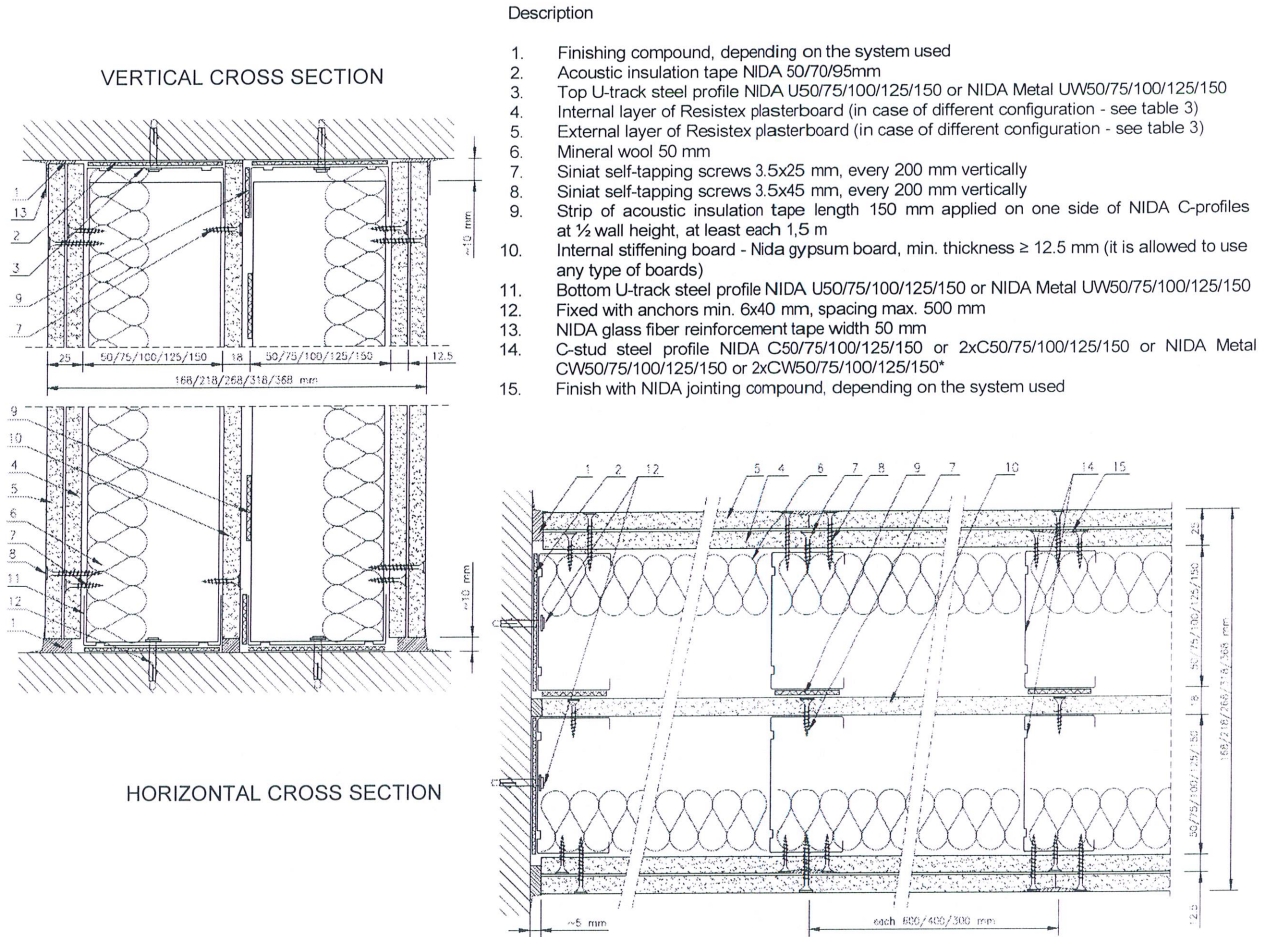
Vertical and horizontal cross-section of anti-burglar non-loadbearing partition wall with double framework (rows of adjoining profiles) and two layers of boards, with internal stiffening boards.
